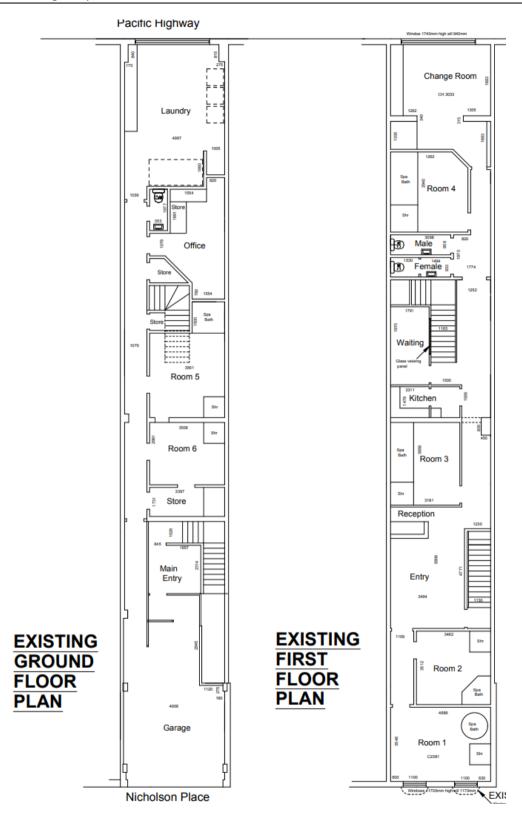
Site Plan (DJL Architectural Design PTY LTD)
